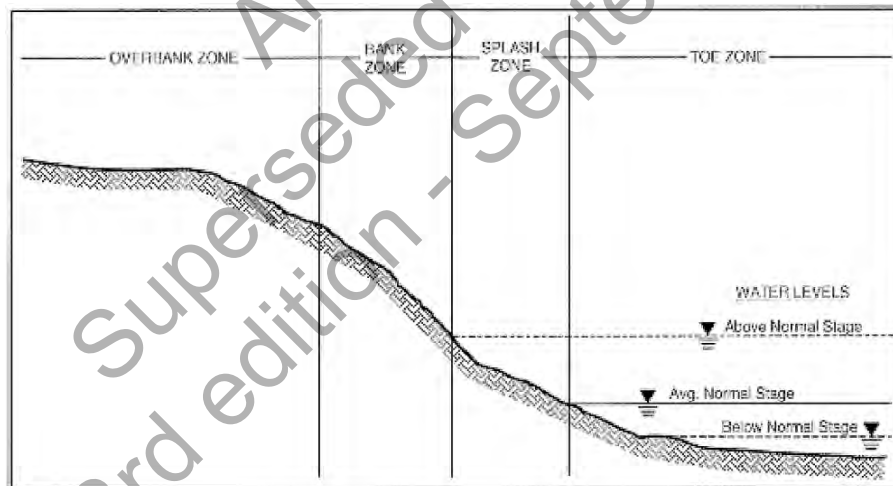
Bank zones defined for slope protection.⁽⁵⁰⁾
